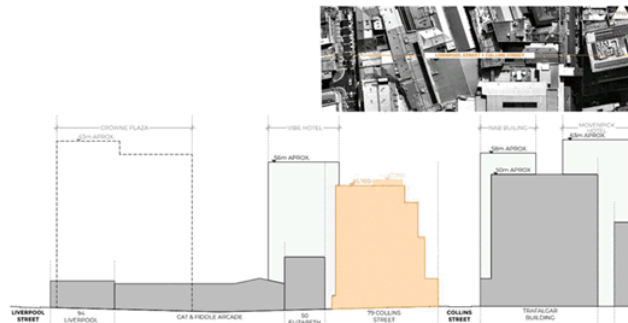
Excerpt from the submitted urban section showing that section of the subject block between Liverpool Street and to just beyond Collins Street to include the nearby Trafalgar and NAB Buildings, and also the Movenpick Hotel.
